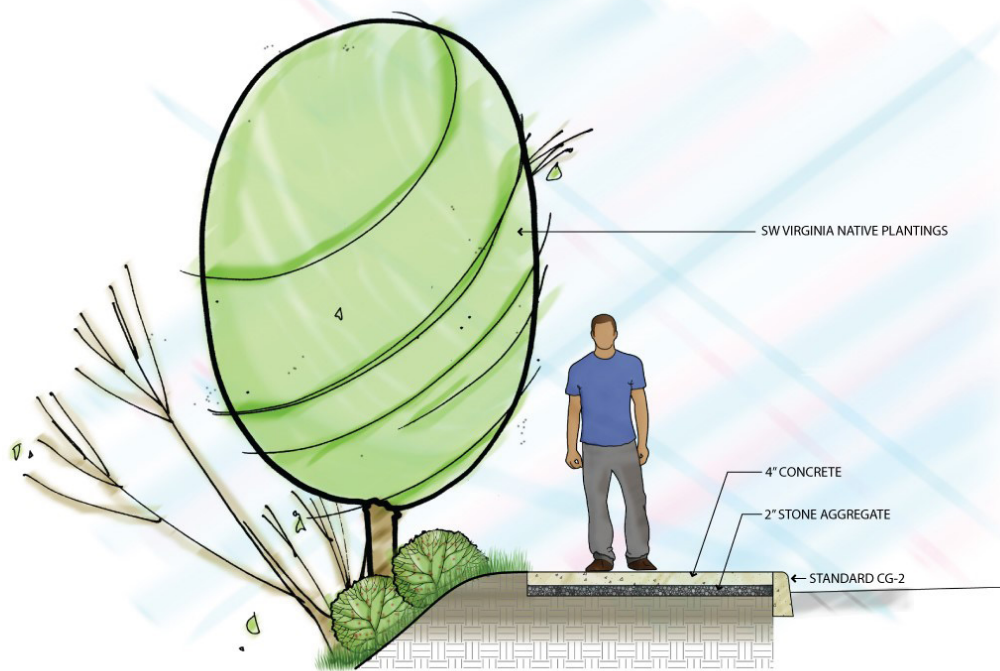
B: Neighborhood Connection with Concrete Sidewalk and Curb
